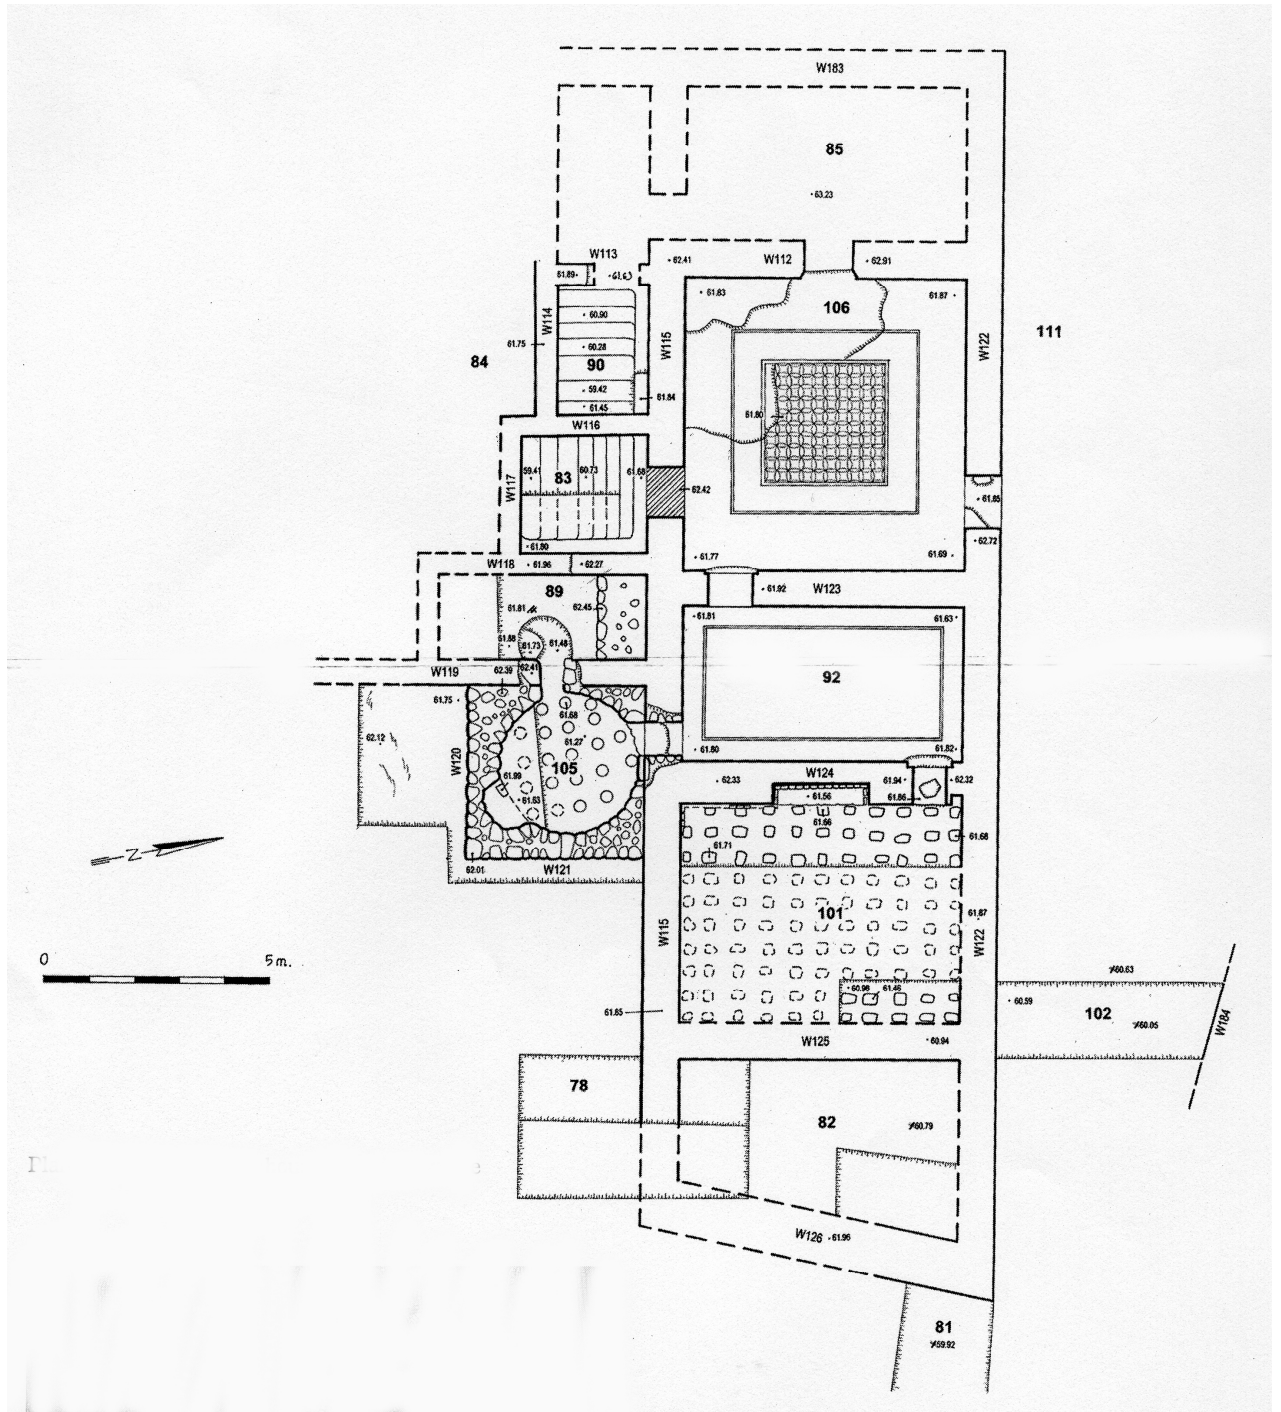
Plan of the Cypros (shoulder) bathhouse [Netzer 2001, plan 35].
